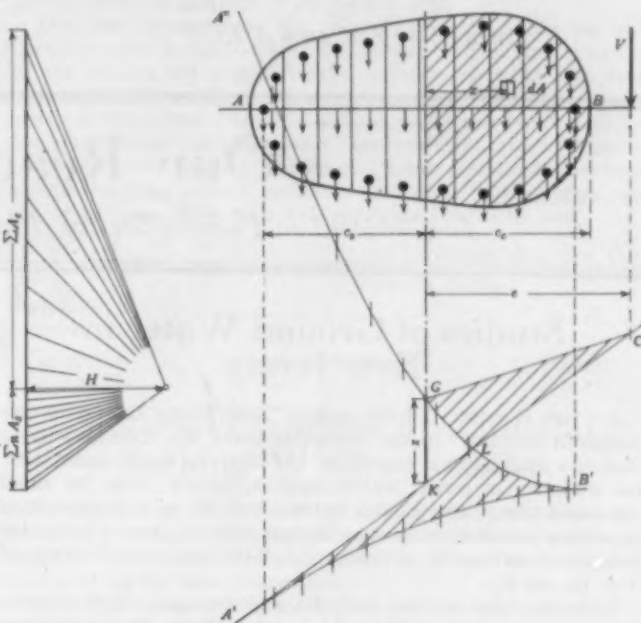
PLAN OF CONCRETE SECTION AND METHOD OF SOLUTION
